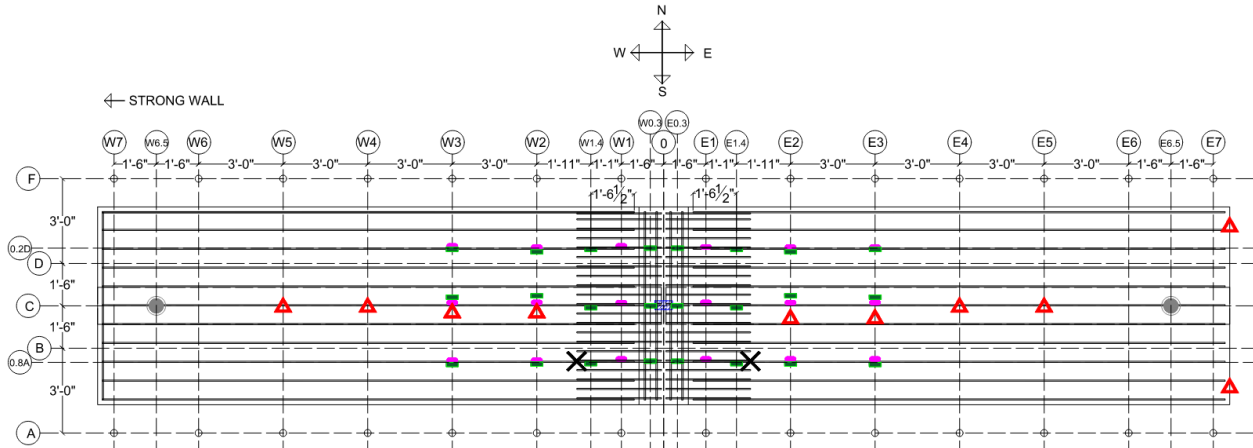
Concept C Instrumentation Plan (Plan View).
